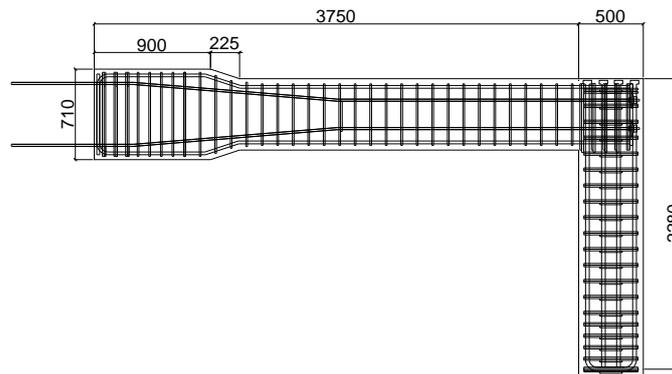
Section of experimental specimen K-PT-N-1 (Unit: mm) (Kwon 2016)
